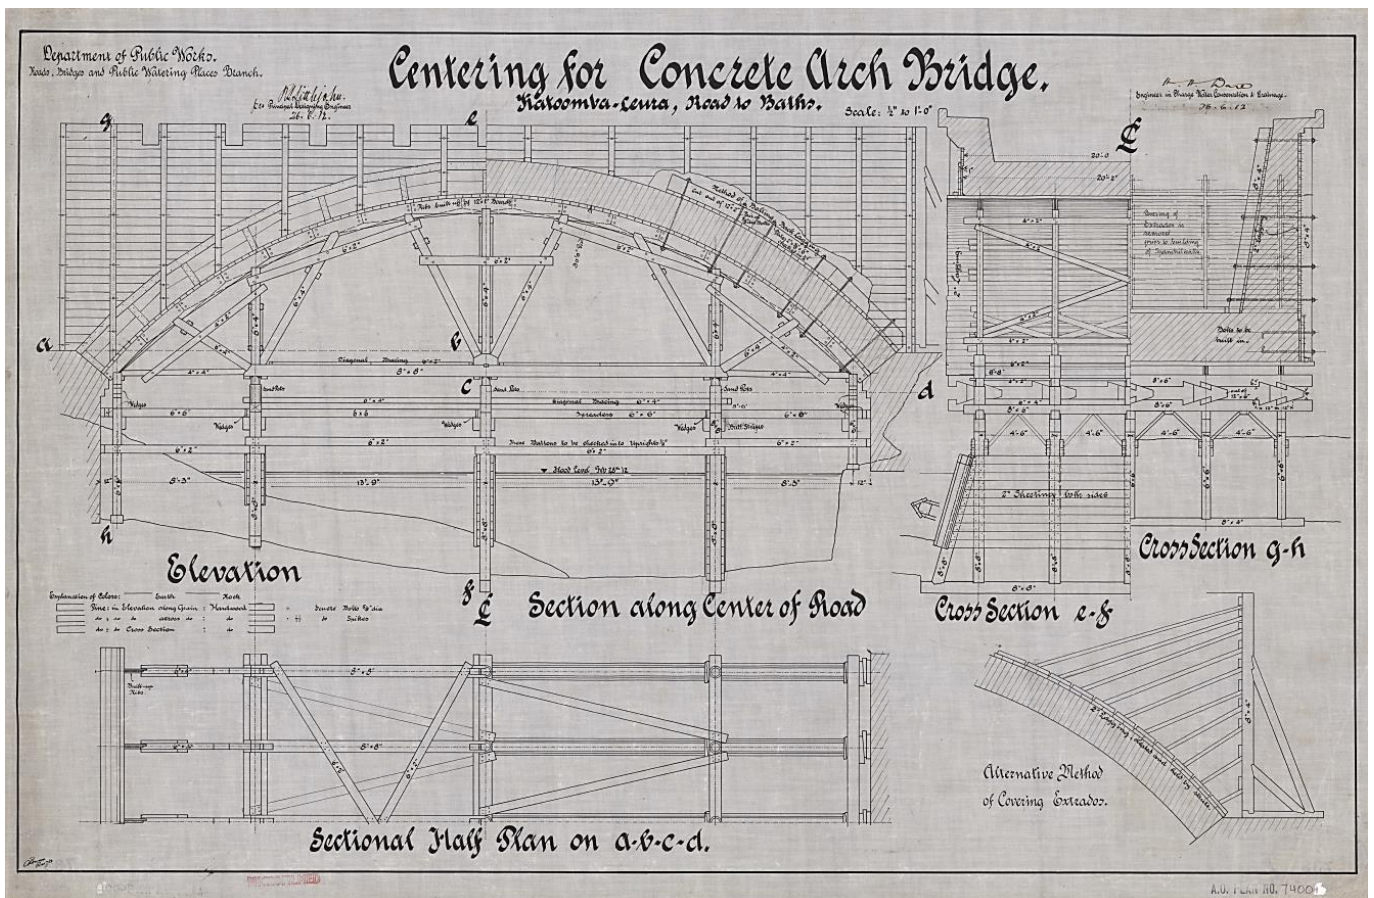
Chelmsford Bridge, Leura - Plan Centering, Public Works Department 1912. (AO Plan No 74001).
